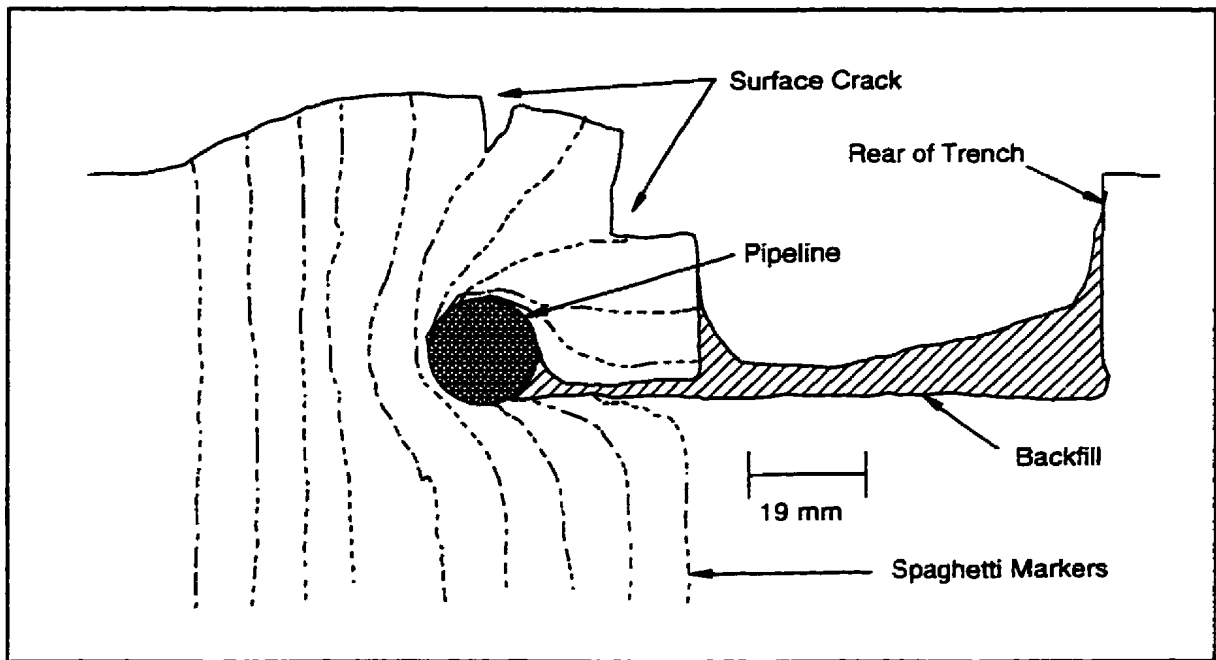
Sketch of excavated cross-section along mid length of model pipeline #1, 60mm wide trench, Test 03.
